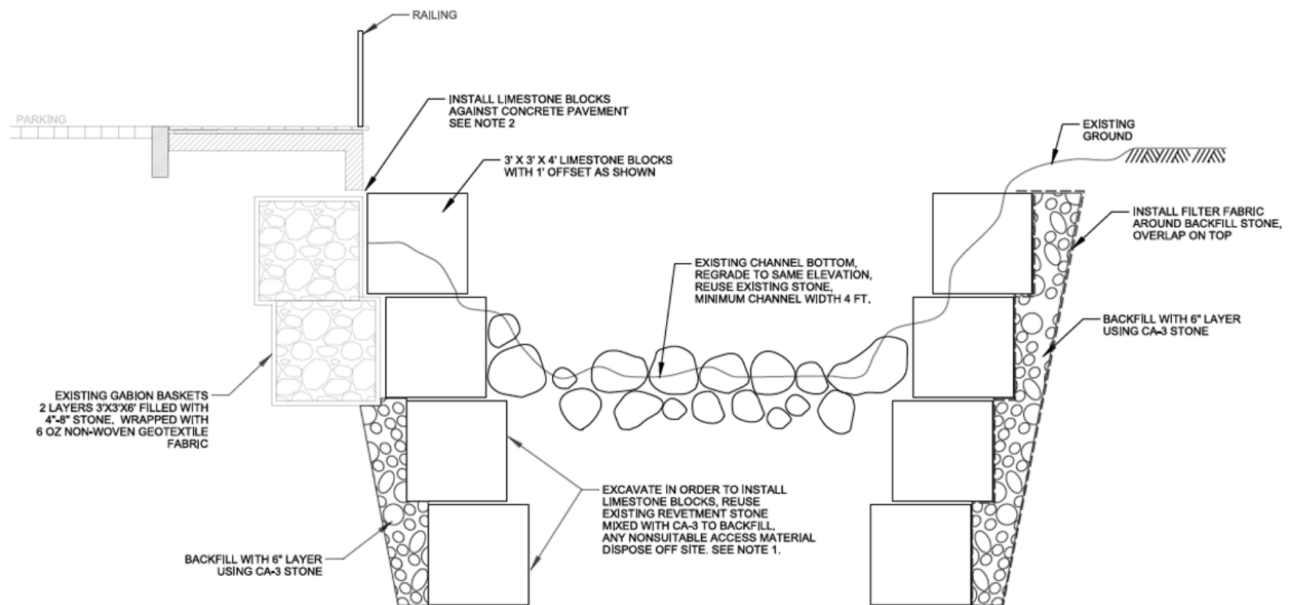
Ravine Typical Cross Section, Sheet CS301 of 2018 USACE Plans
